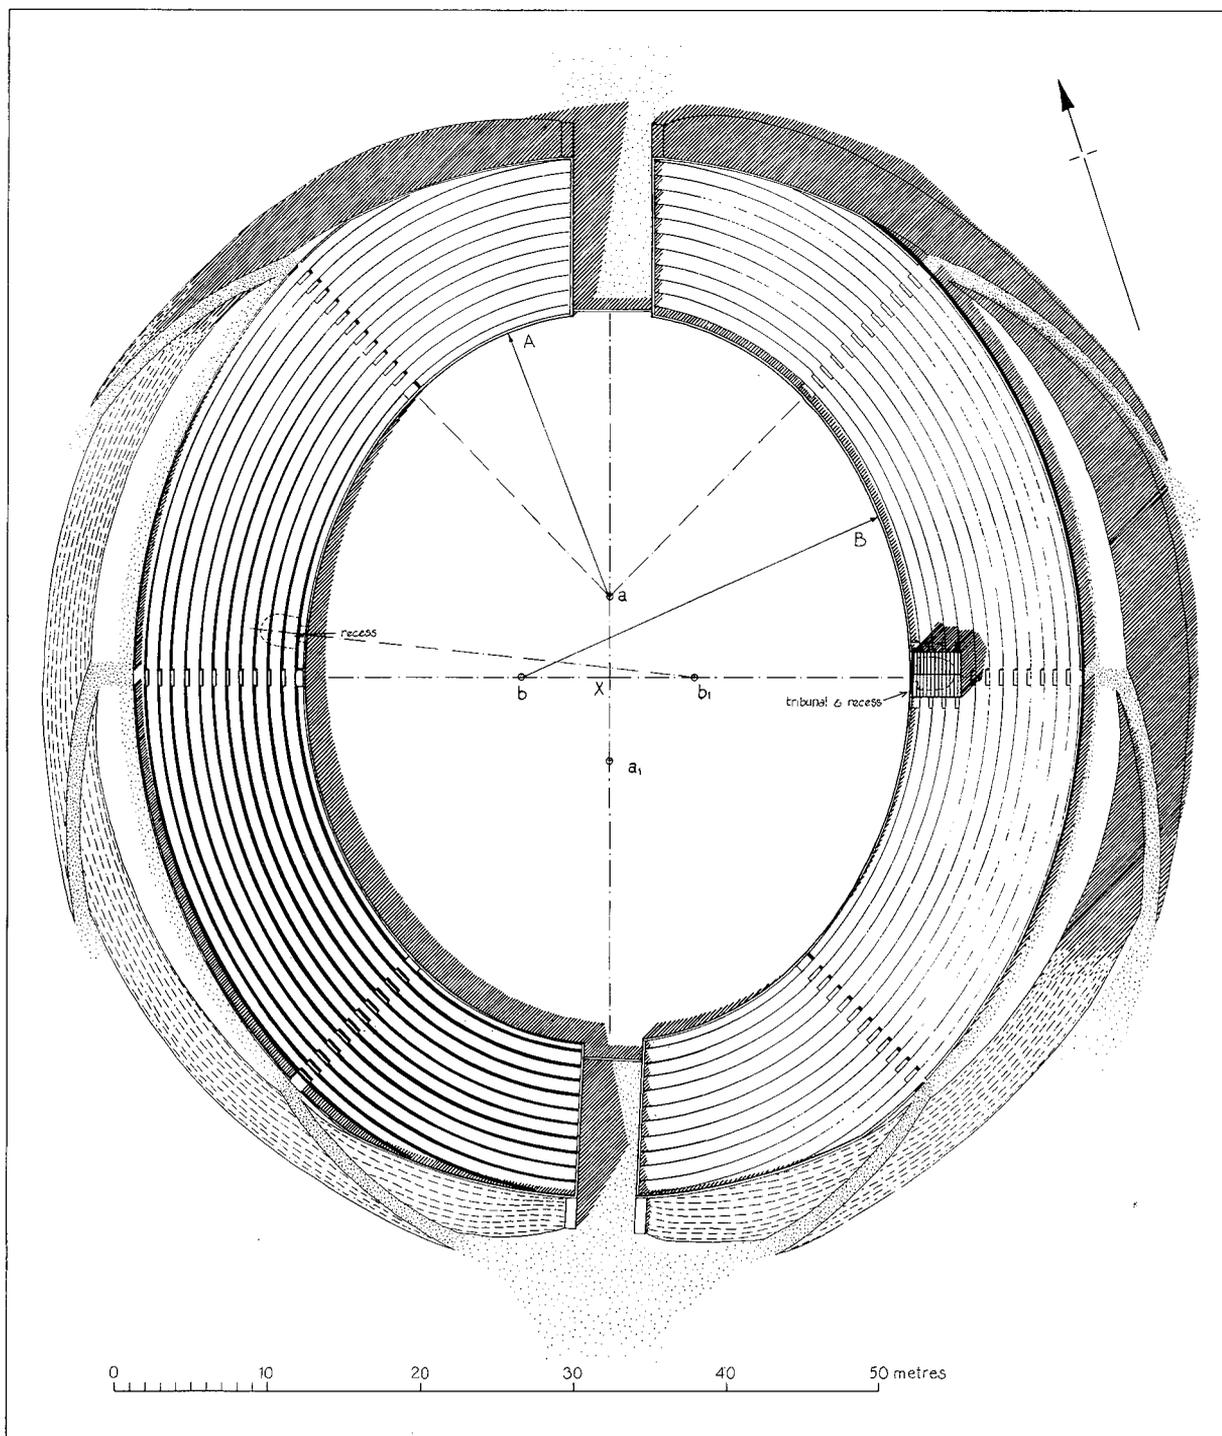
Reconstruction and conjectural layout of Stone-phase amphitheatre: Plan.
